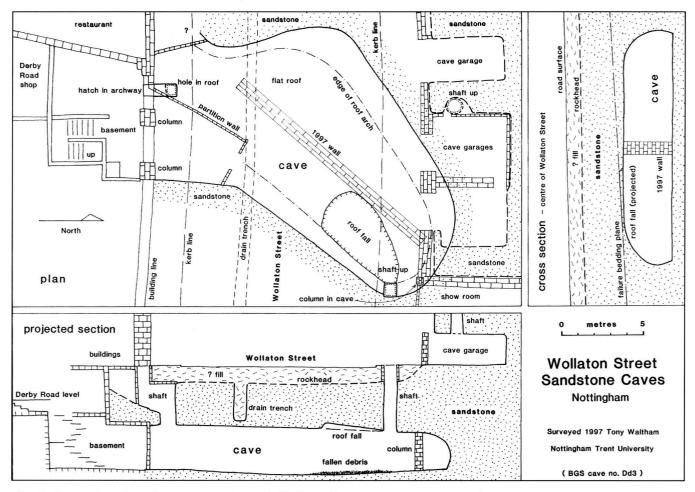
Plan and profiles of the large cave beneath Wollaton Street.
